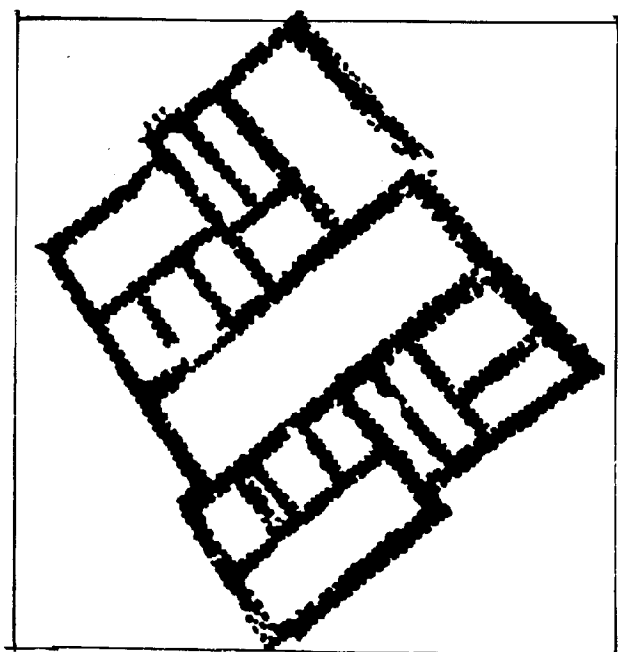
Plan of stone foundations of House in level XIV at Tepe Gawra (after Tobler 1950, pl. XIV).
